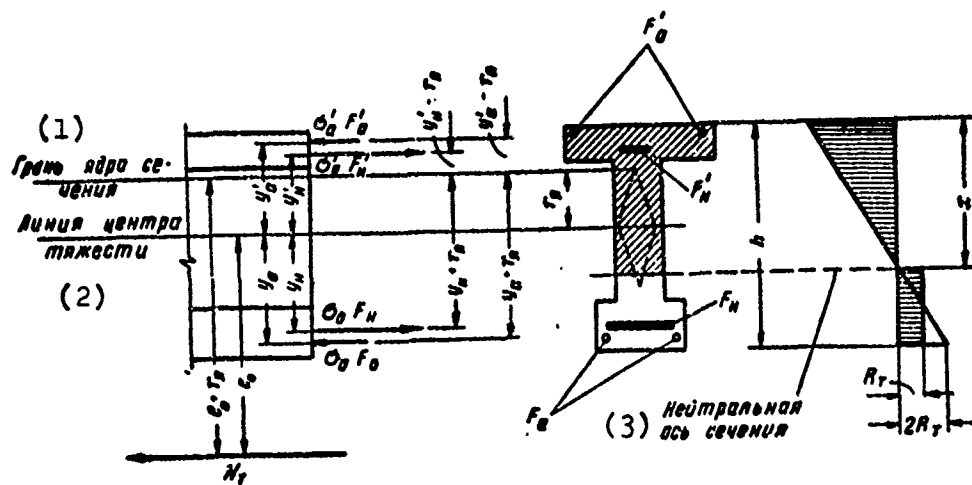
Diagram of the distribution of forces and stress diagram in the transverse section of an eccentrically tensile-stressed prestressed reinforced-concrete element in rating the zone tensile-stressed by an external load for crack formation, in which stressed and unstressed reinforcement is contained.
